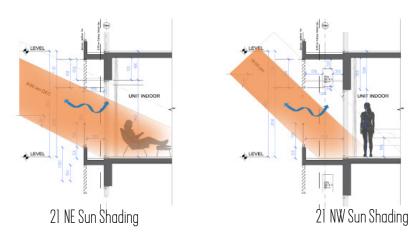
c Typical section of the Living ,Dining and Bedroom
